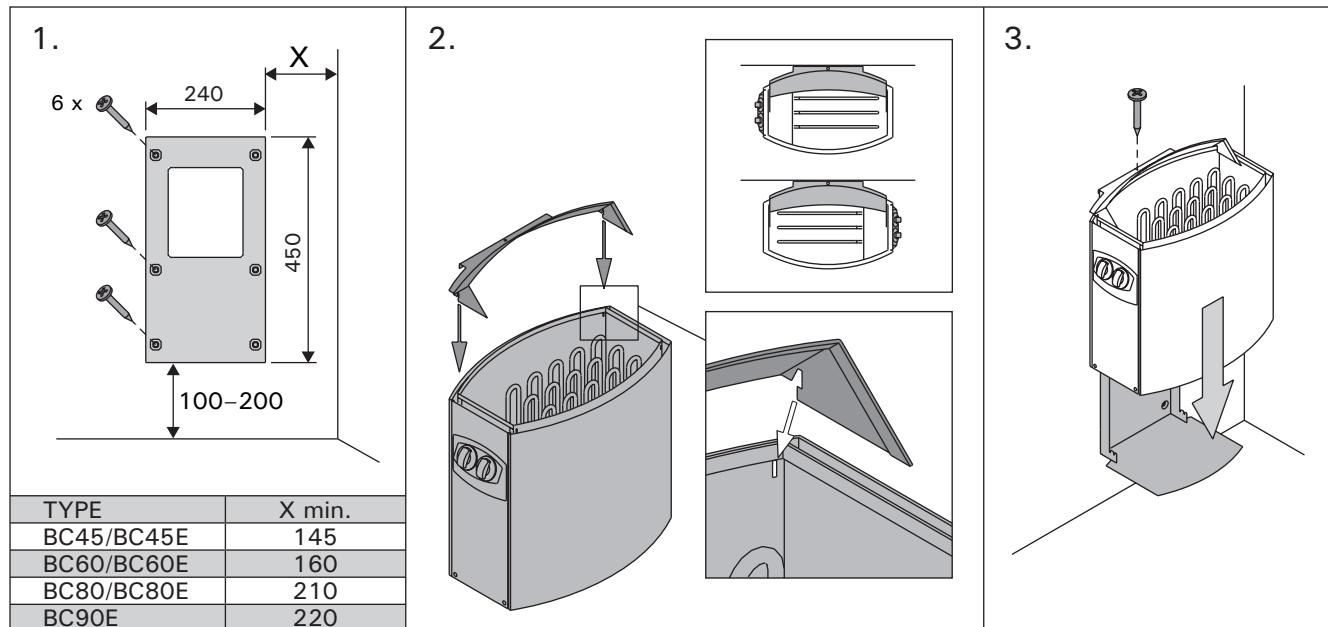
Fastening the heater on a wall (all dimensions in millimeters)
